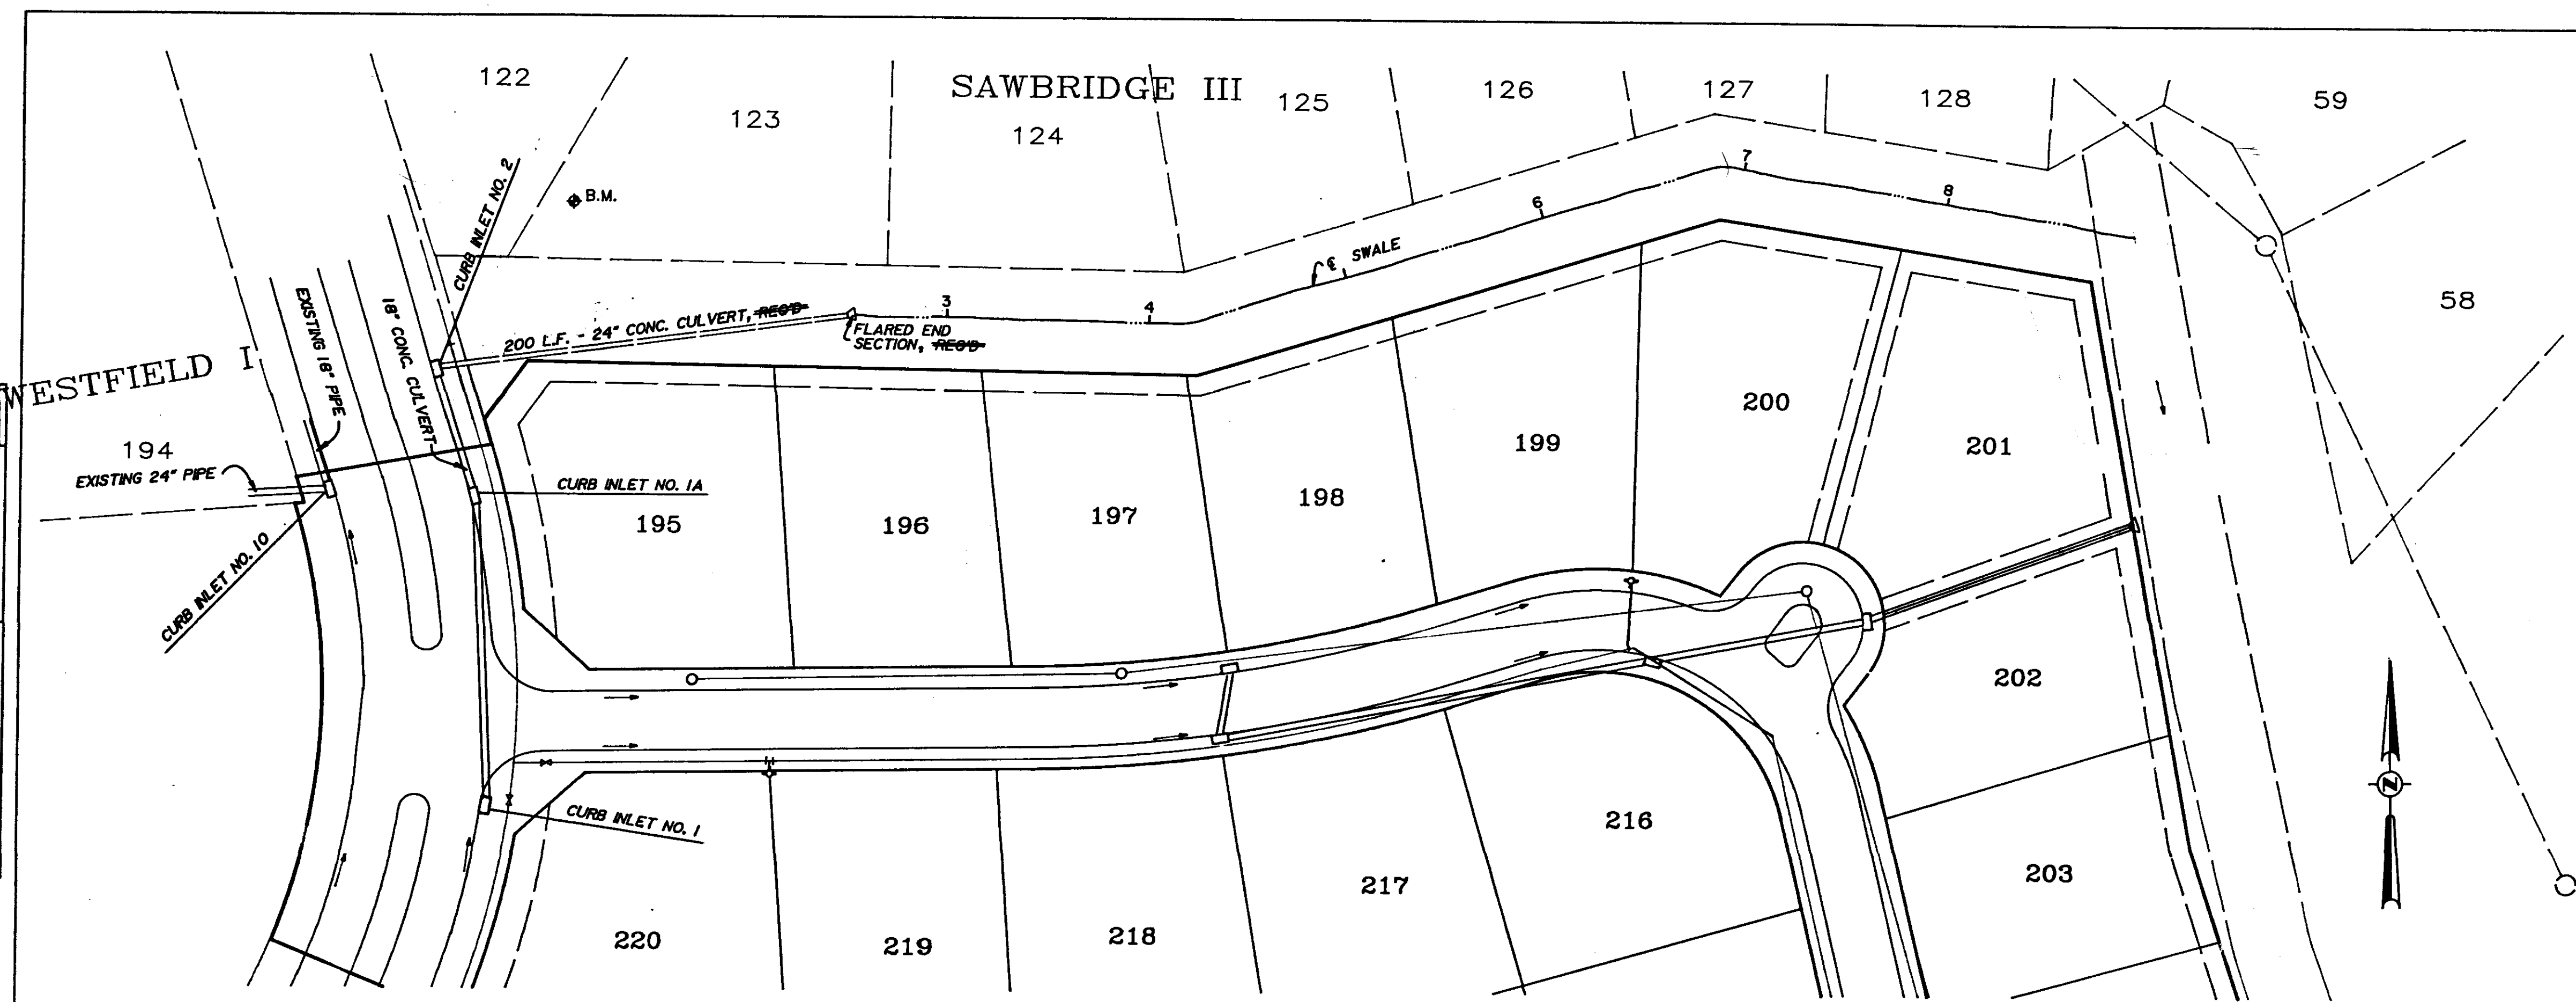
SINGLE PLAN AND PROFILE FULL DOT
